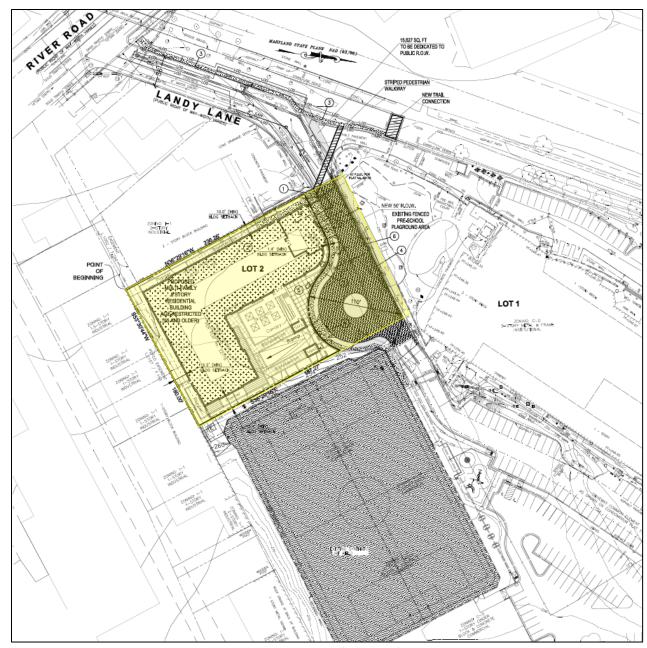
Subject Public Access Easement Shown (in yellow) on Approved Site Plan 820150080
